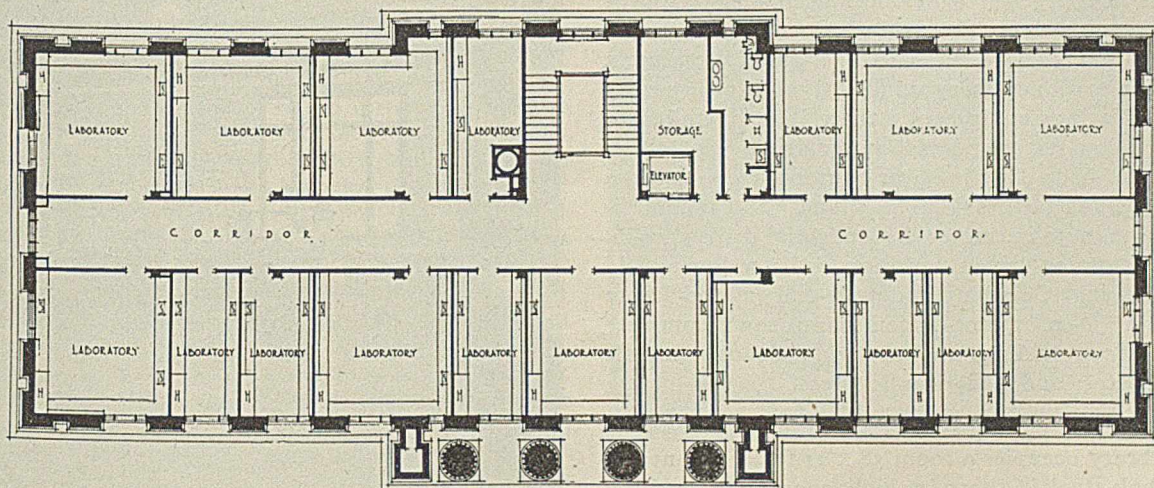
SECOND AND THIRD FLOOR PLAN, MELLON INSTITUTE OF INDUSTRIAL RESEARCH
